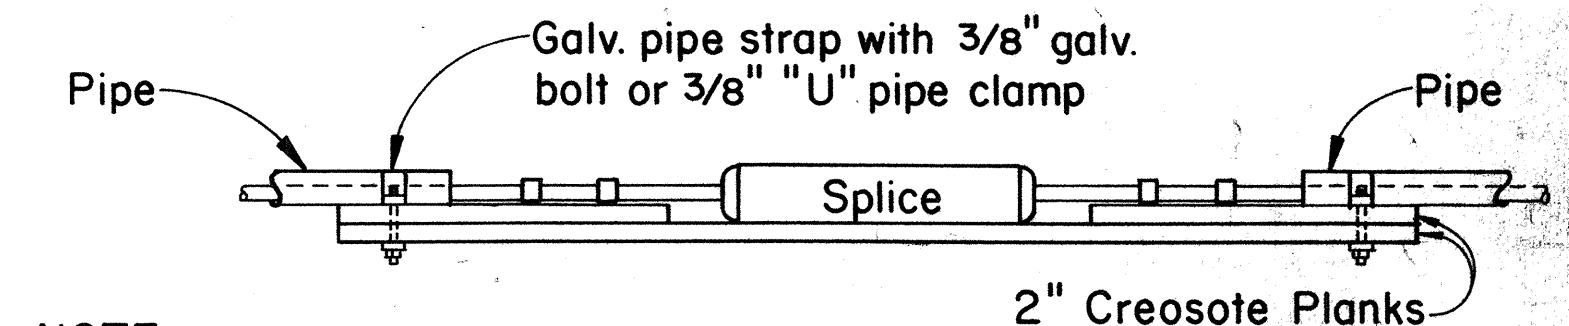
DETAIL OF CABLE CROSSING OVER STORM CULVERTS-IRRIGATION PIPES, OTHER UTILITIES, OR FOREIGN PIPES
